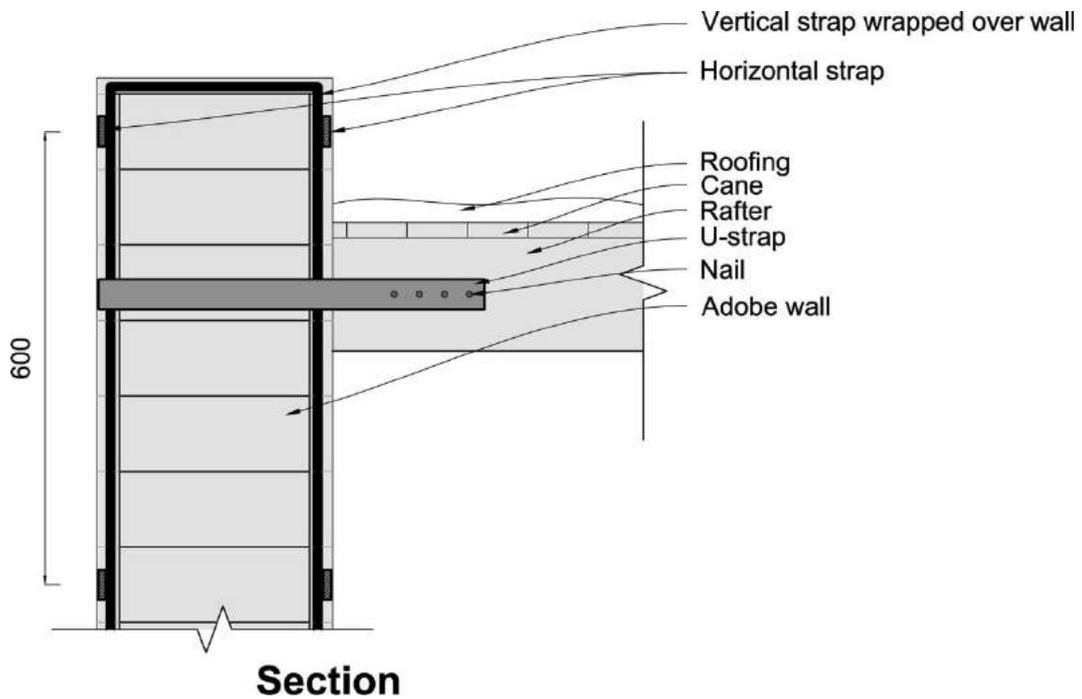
Section through the top of a parapet wall showing a U-strap wrapping around a vertical strap and nailed to a rafter. This detail prevents the wall moving away from the rafter, causing it to fall.
